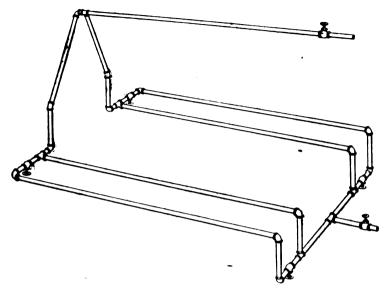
Connections of Outer Groups of Pipes of Greenhouse Shown in Fig. 175.
